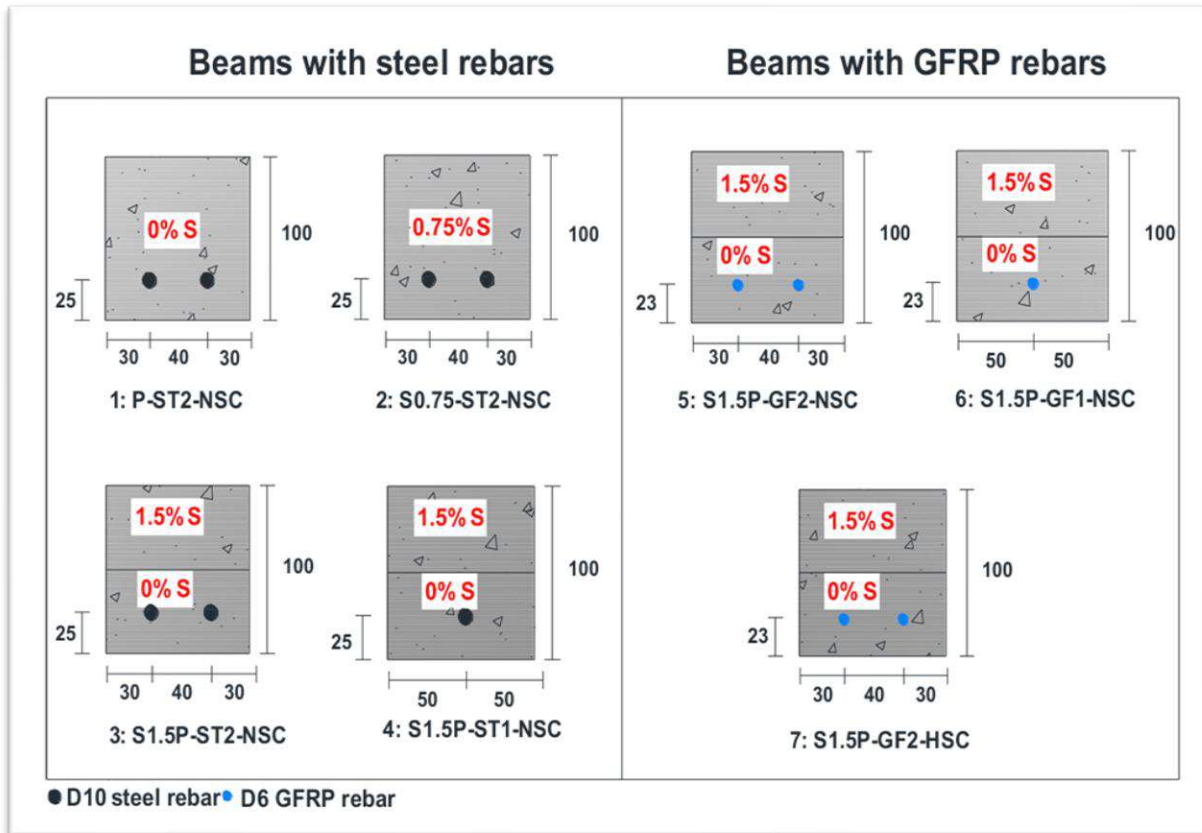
(a) the impact of adding and stacking fibers, (b) GFRP rebar is used in place of steel rebar, and (c) Concrete strength is taken into account (Nematzadeh & Fallah, 2021).
